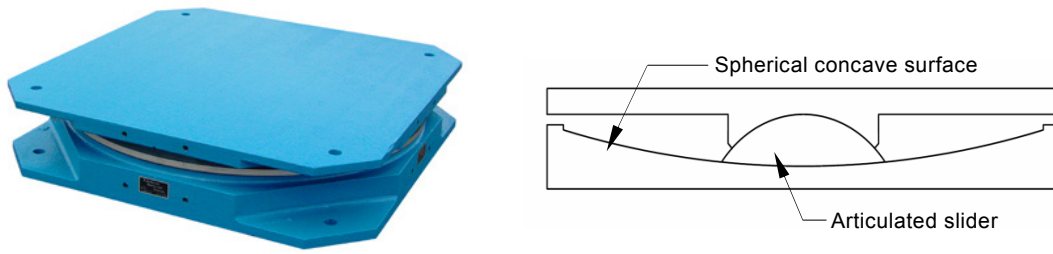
Photo (left) and section (right) of a typical FP bearing
